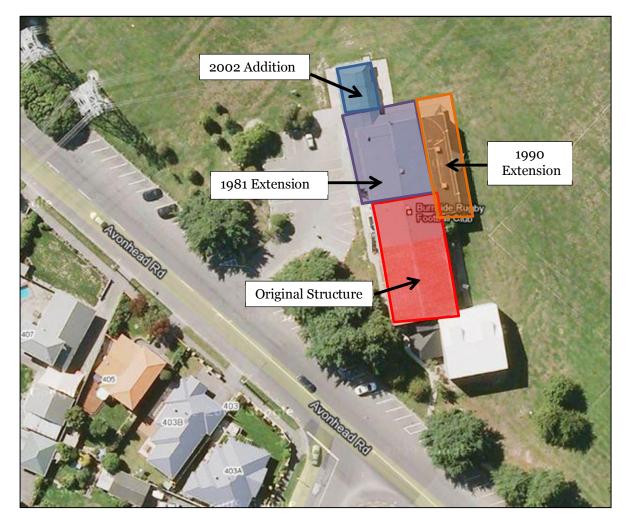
Burnside Rugby Football Club Location and Building Construction Phases
